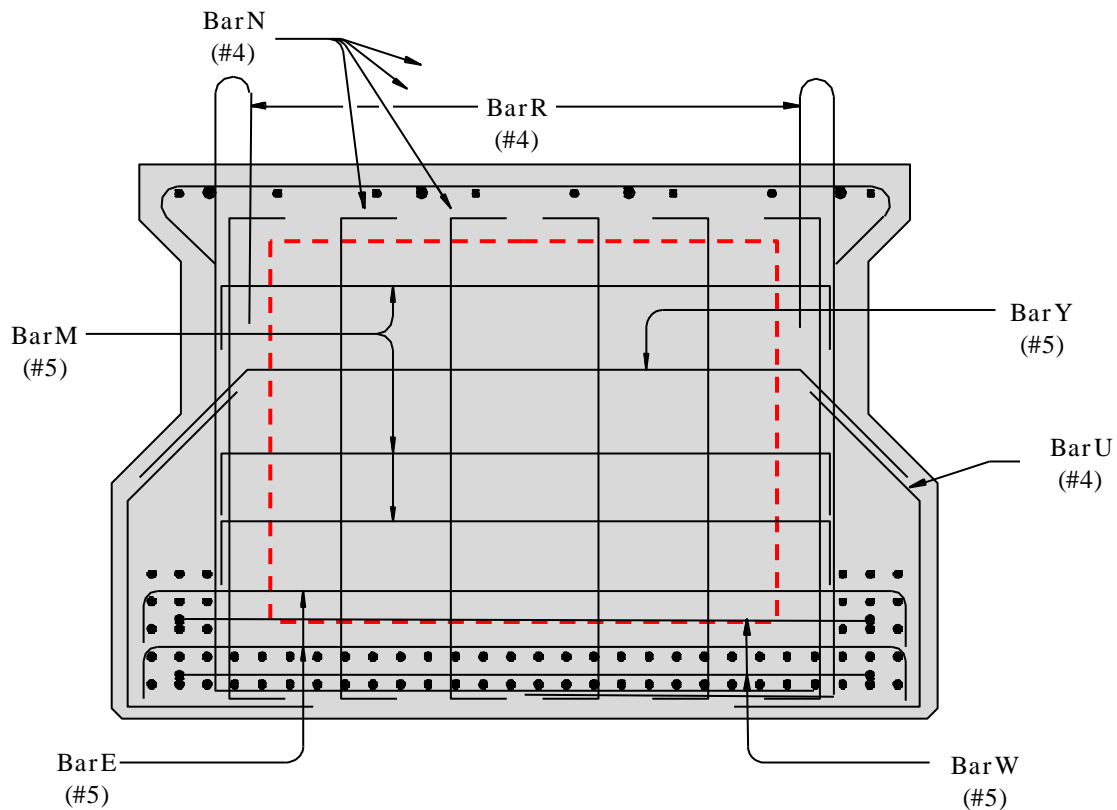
First curtain of 5XB40 end-block reinforcement
